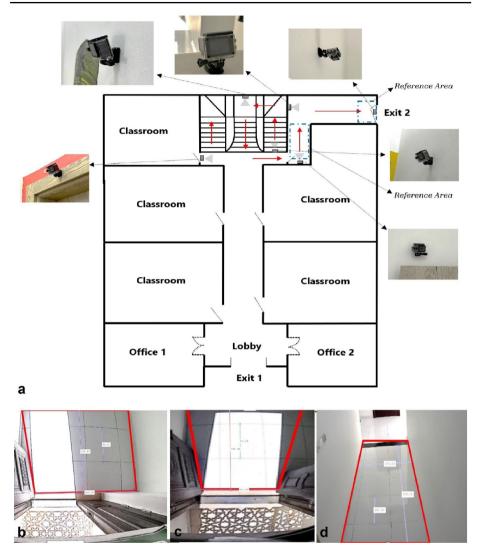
a Floor plan of school ground floor and layout of Go Pro cameras mounted in different location; b reference area calculated for 70 cm width exit door; c reference area calculated for 105 cm width door; d reference area calculated for the corridor
